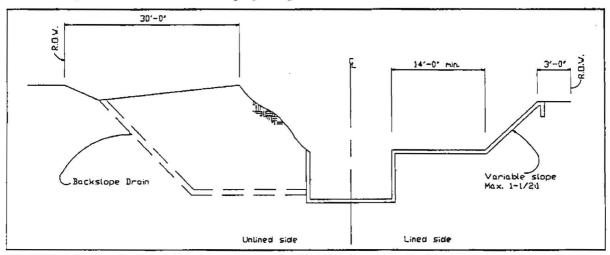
Concrete-Lined Low Flow Channel with Maintenance Shelt
